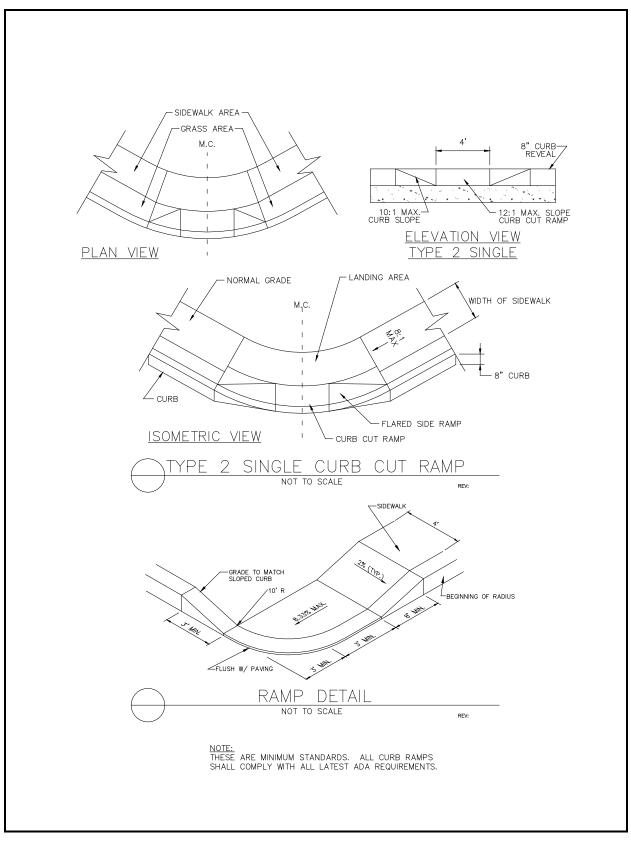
Single Curb Cut Ramp and Ramp Detail
